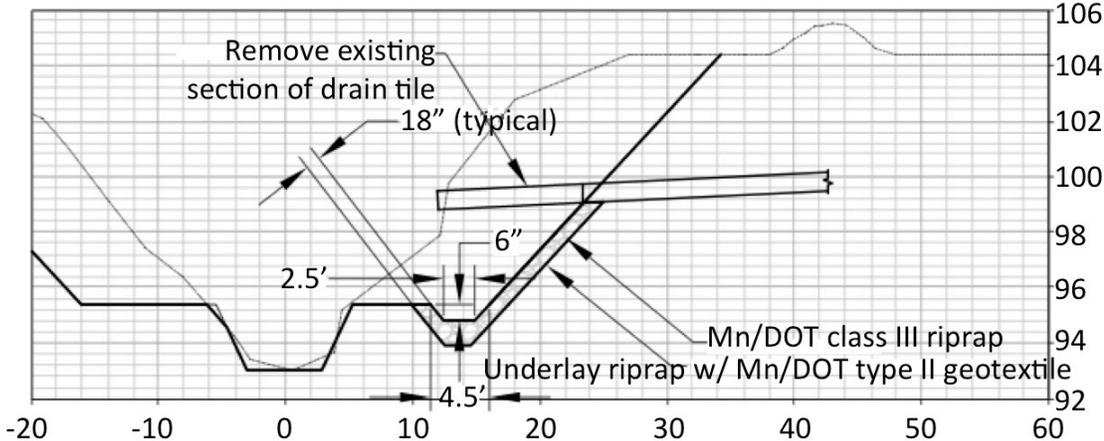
Detail of Tile Outlet to a Linear Treatment System. Dimensions in Feet and Inches. Drawing by Joel Peterson.
